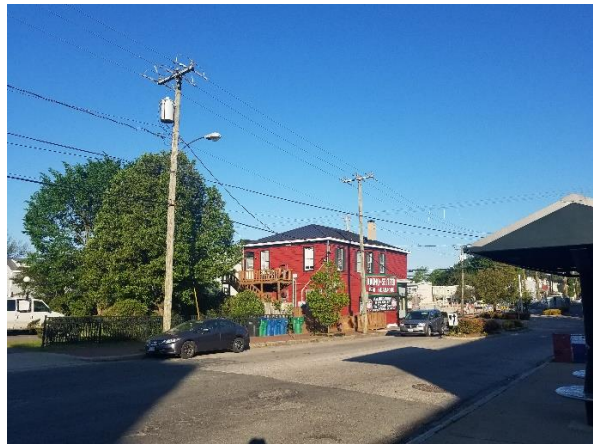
623 N. 25th Street, building adjacent to the project site.
